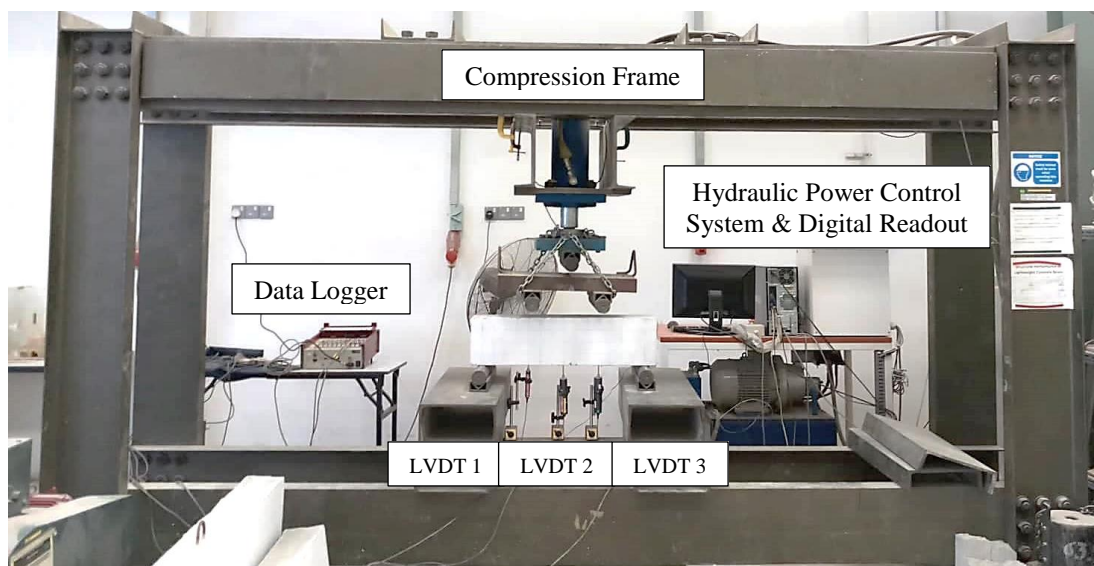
Test Set-up and Arrangement of External Instrumentation
